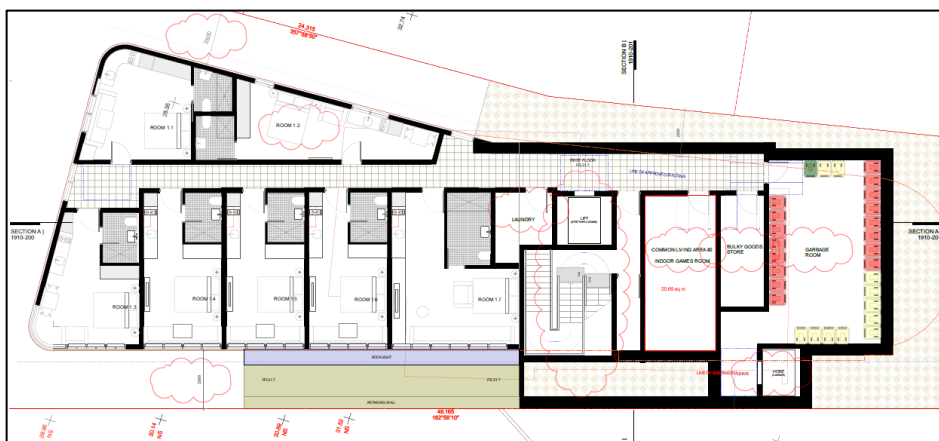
Approved first floor plan under DA/222/2020 (Source: SHED)
